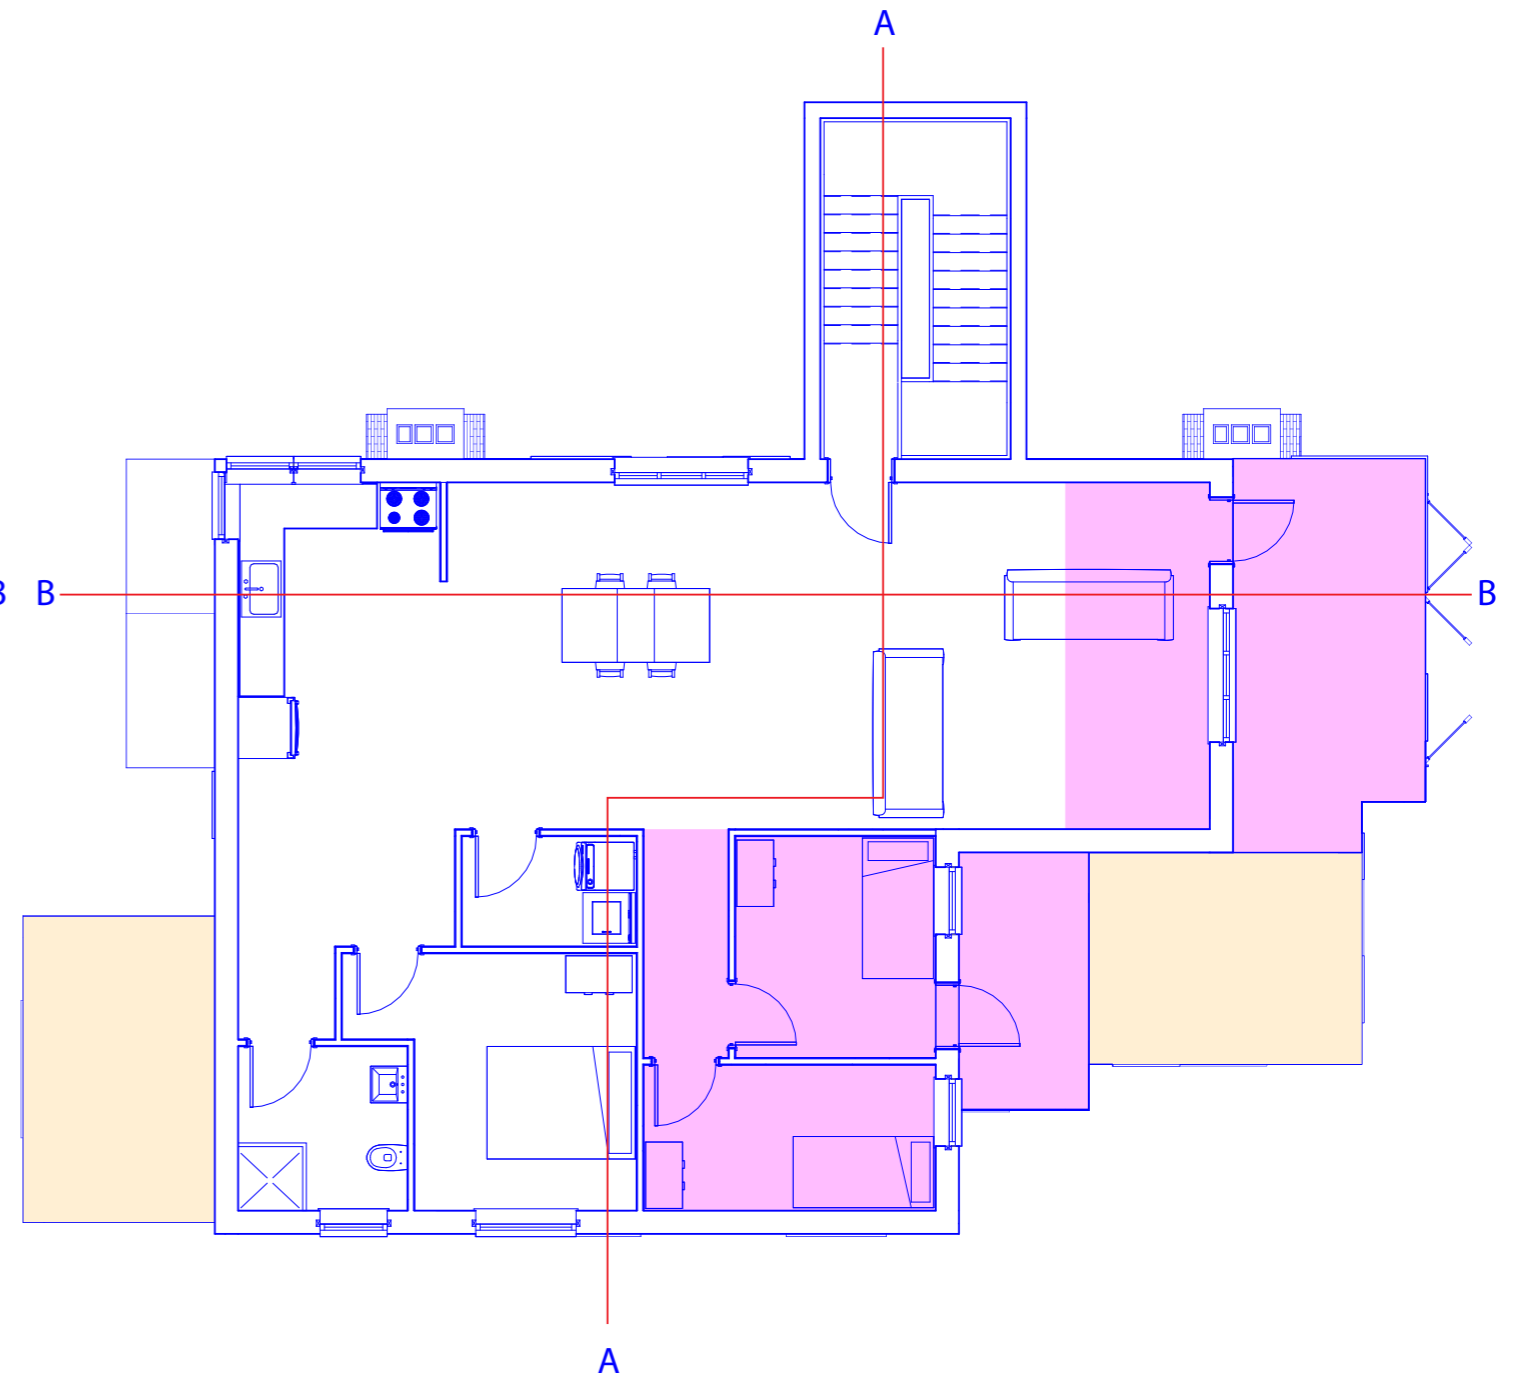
Scenario three floorplan of the 1st floor highlighting the incremental expansion potential, by author.
